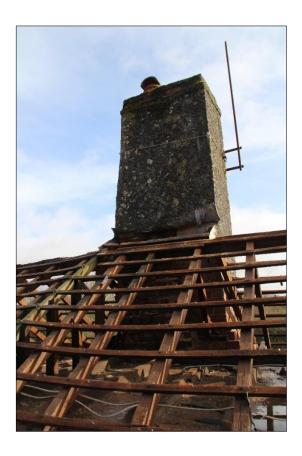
Southern gable end showing brick wall with battens for hanging slate tiles (removed)
